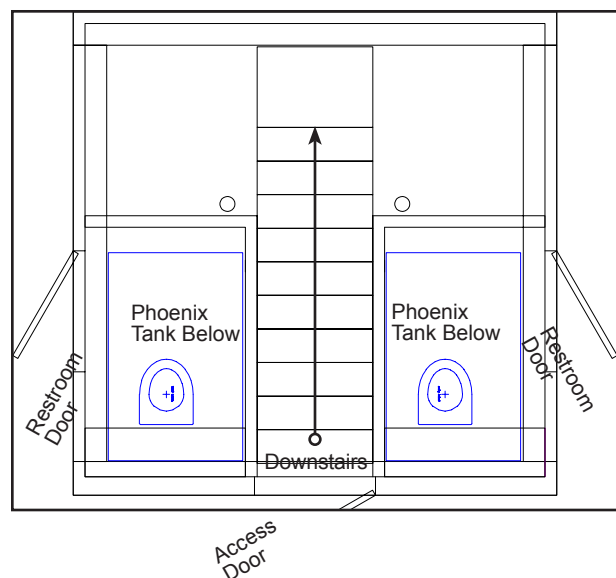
Top view of a toilet building with two Phoenixes located in a full basement with stairway access.
